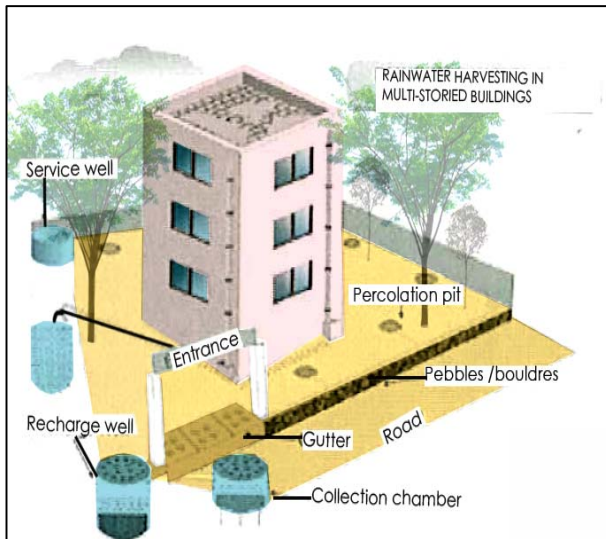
Typical Rainwater Harvesting for Multi-Storey Building.
